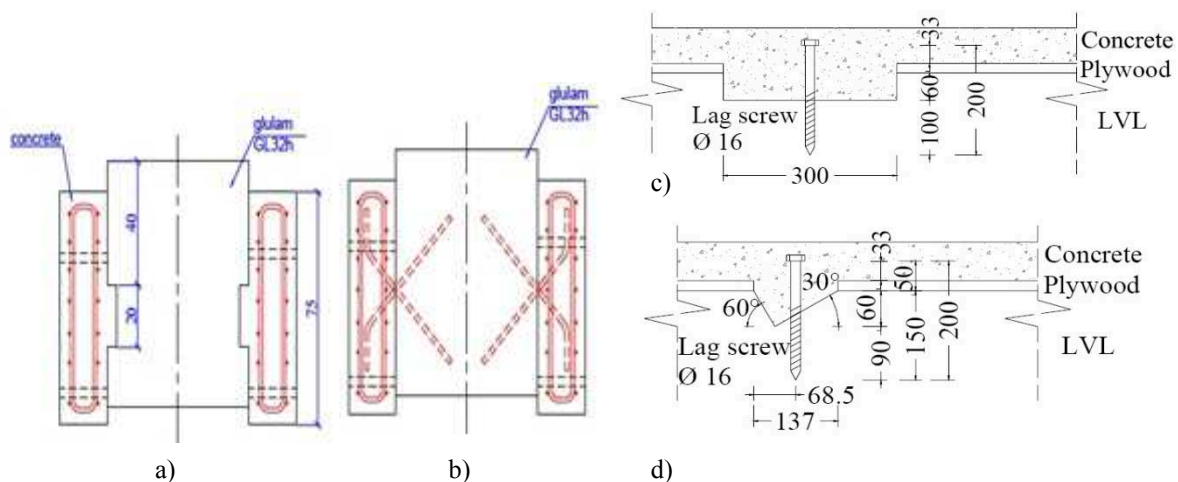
(a) specimen with notch (b) specimen with rebar [10] (c) specimen with rectangular notch and screw (d) specimen with triangular notch and screw [8]
